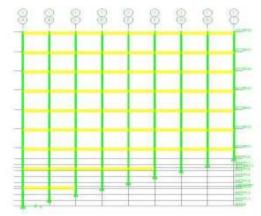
Elevation of step back building for eight storey model (300 slope)
